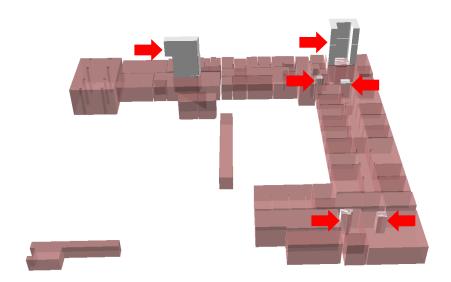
Stairs are highlighted in a portion of the first floor of the 3-dimensional building model.
